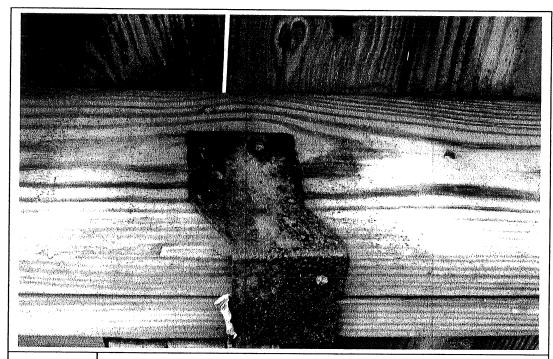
0116 1759.jpg Level 5 railing attachment to building near column line A. Install Simpson L30Z anchor between 2x4 and top plate here to anchor top plate. Add screws to balusters at each baluster throughout porch, typical.
